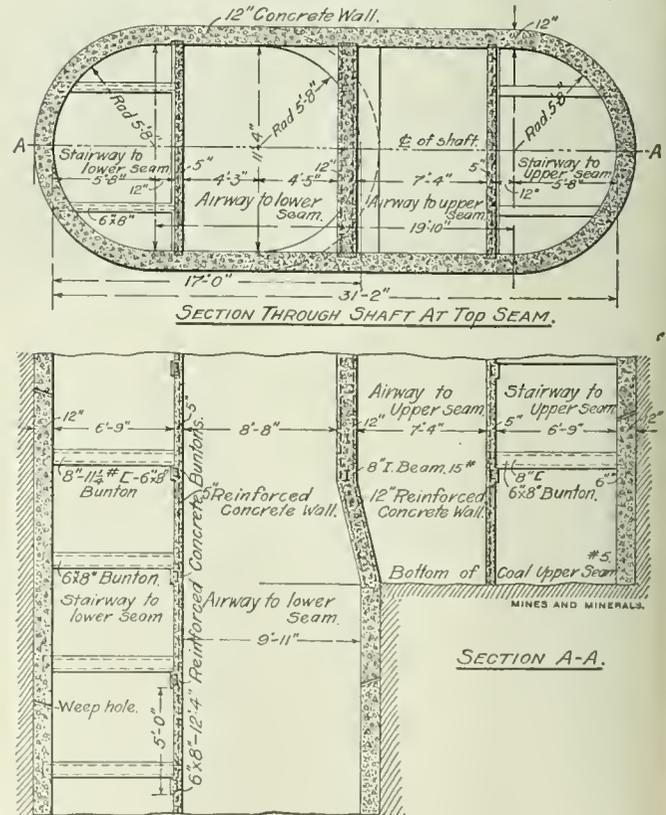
SECTION AND ELEVATION OF SHAFT LINING
